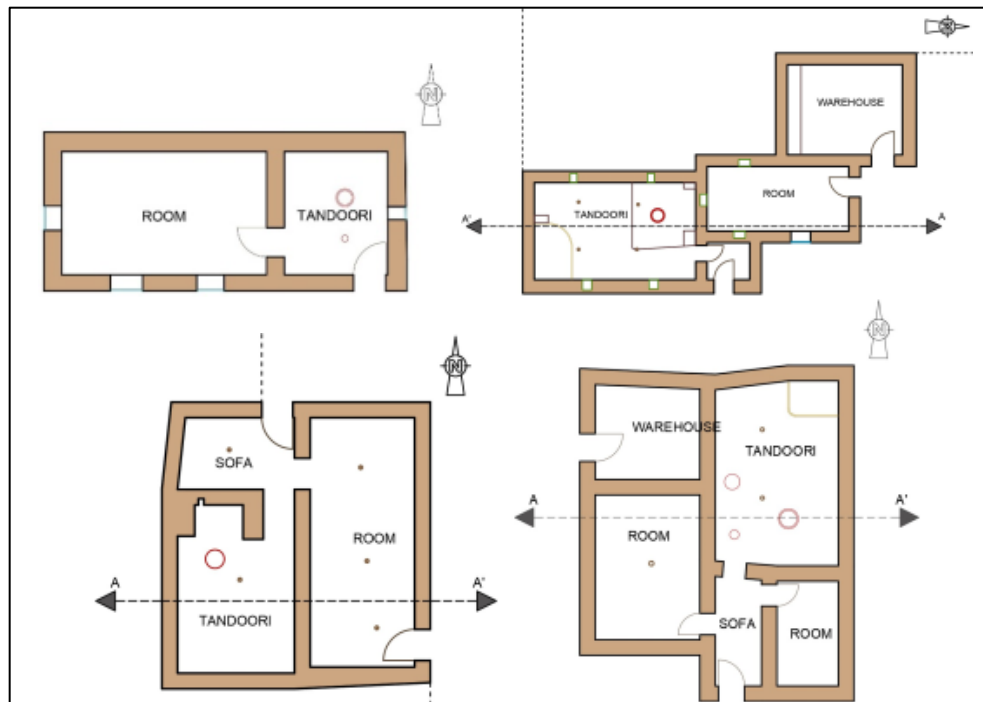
Plan of tandoori houses numbered 1-3 without sofas and tandoori houses numbered 2-4 with sofas in Mollatopuz Village
